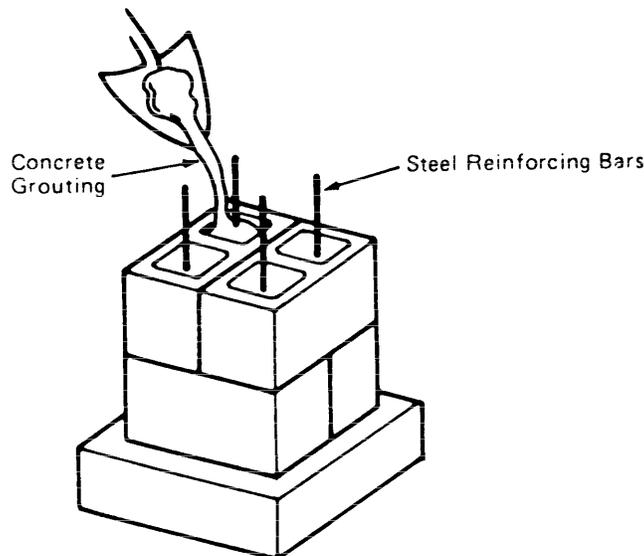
For piers exceeding 80 inches in height the concrete blocks must be filled with concrete grouting and steel reinforcing rods utilized.
